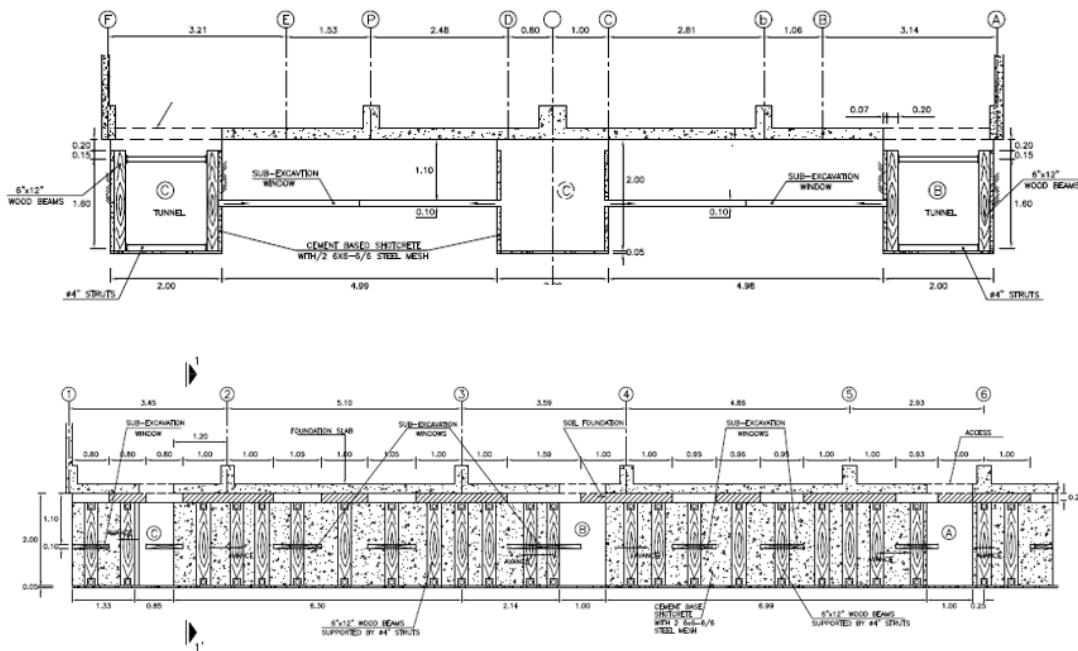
Top: Maneuver Tunnels and sub-excavation windows, Bottom: Retaining system and details
